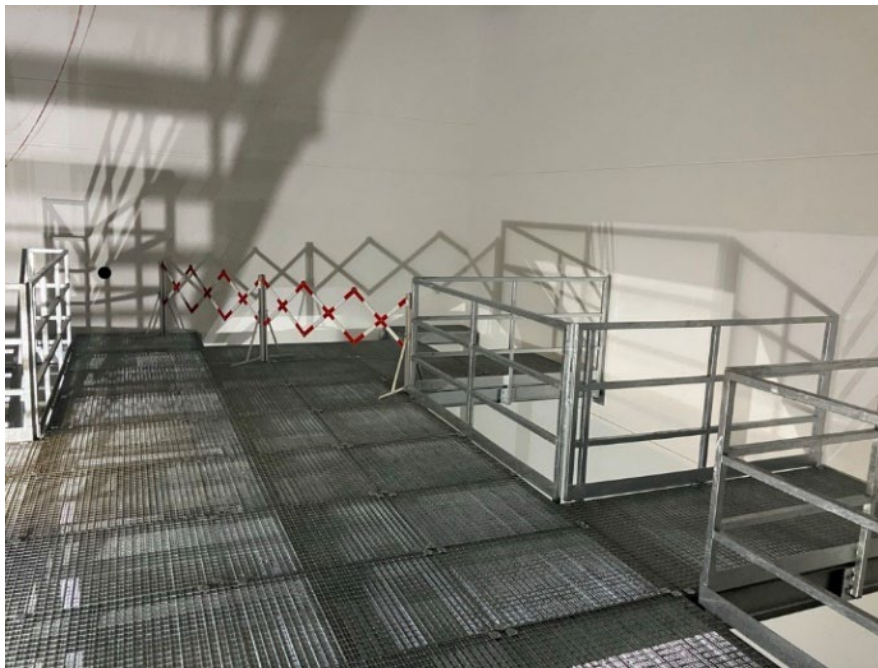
New steel structures ready to host the Demo Plant (January 25)
